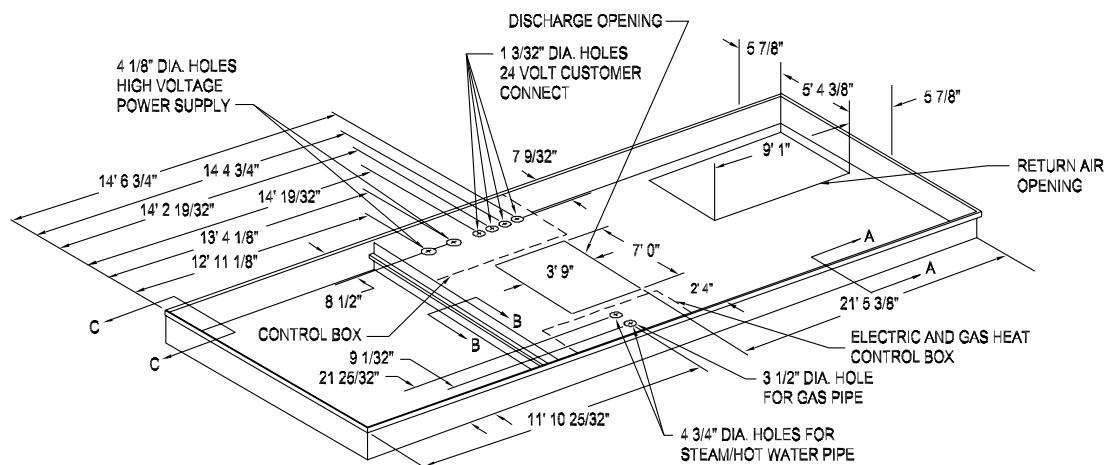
Roof curb heating/cooling and cooling only rooftops — 90, 105, 115, 130 ton air-cooled
